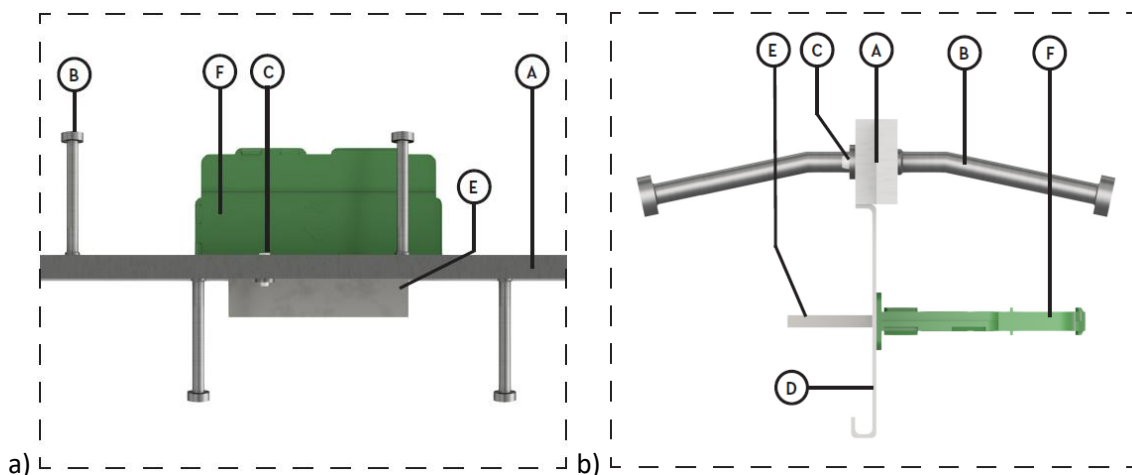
Projoint Plus S 50x05 DP1: a) Schematic drawing of the top view; b) Schematic drawing of the cross-section view
